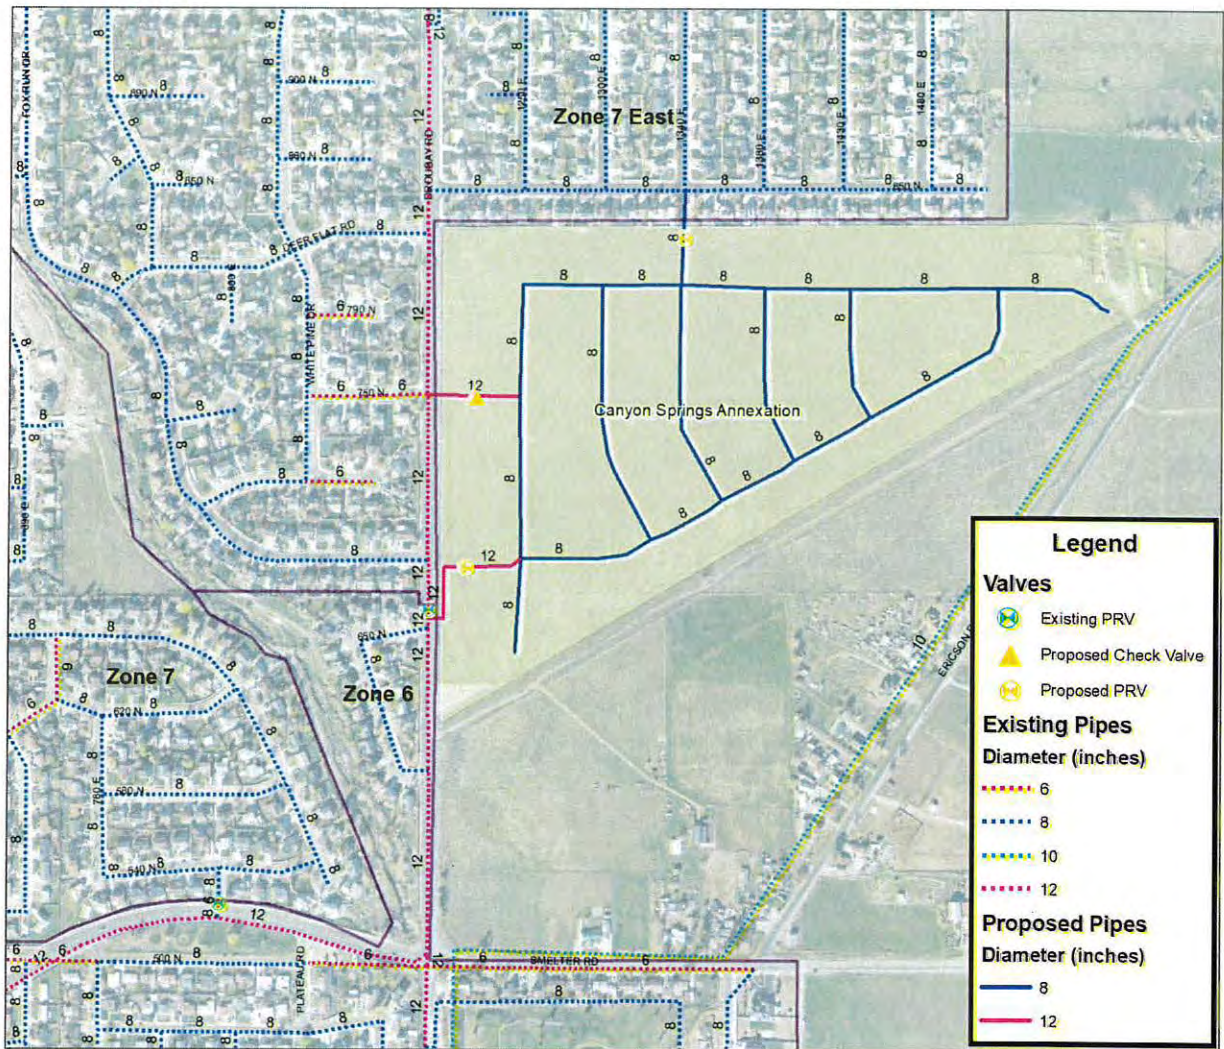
DEVELOPMENT LOCATION AND DRINKING WATER SYSTEM PIPE SIZE
